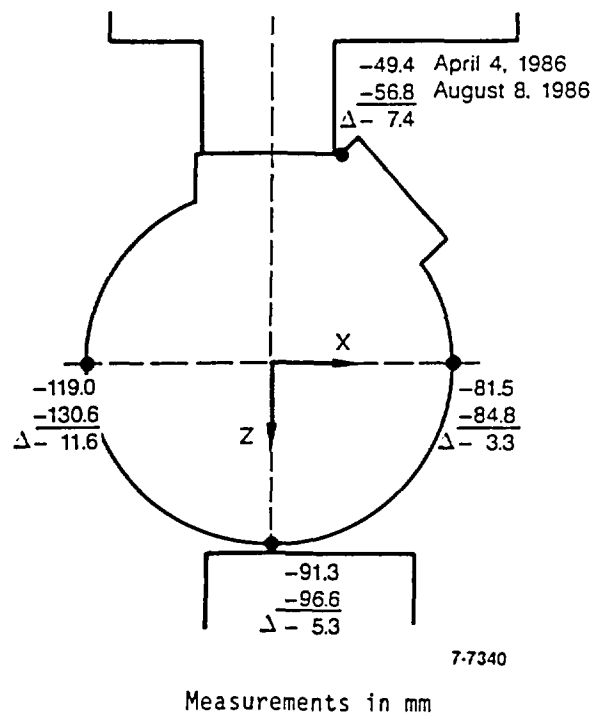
Comparison of building foundation elevation before and after the SHAG experiments.
